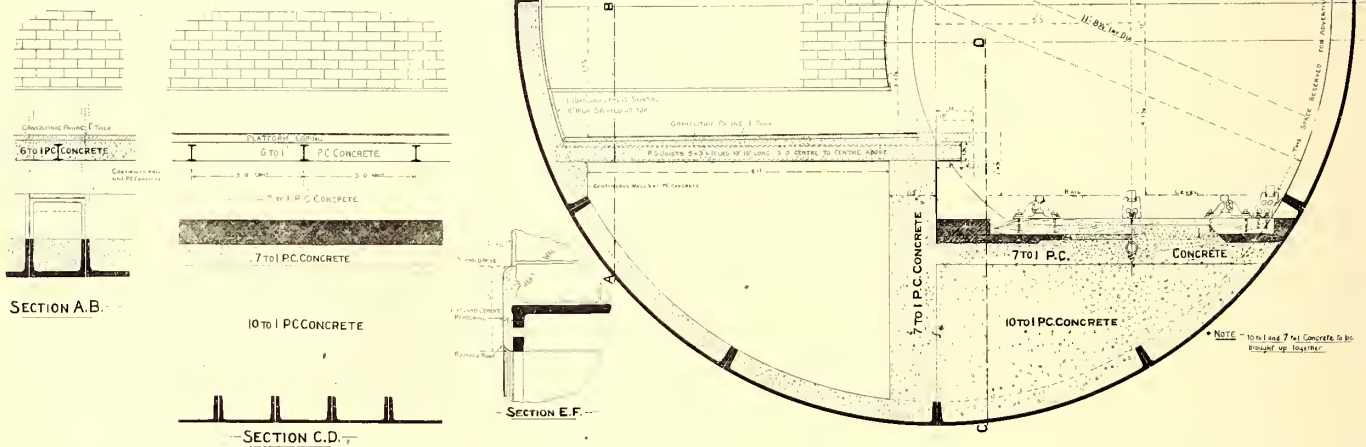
TYPICAL CROSS SECTION OF TUNNEL, SHOWING PLATFORM, TILING, CONCRETING, ETC.
